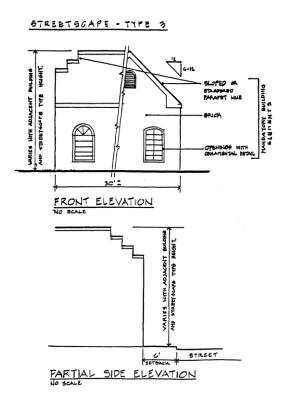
BRICK STRUCTURES DISTRICT-STREETSCAPE, TYPE 3
